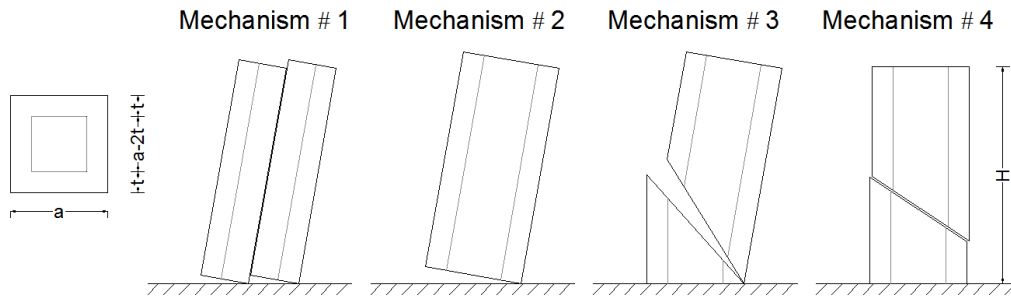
Geometrical properties and possible failure mechanisms of masonry towers.
